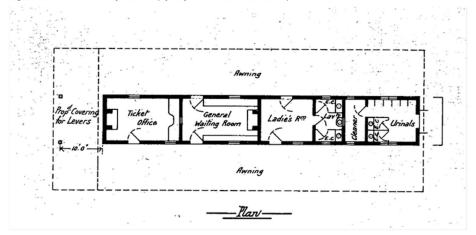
Plan of Killara Station building as constructed and completed in 1909 (Sydney Trains Virtual Plan Room)
